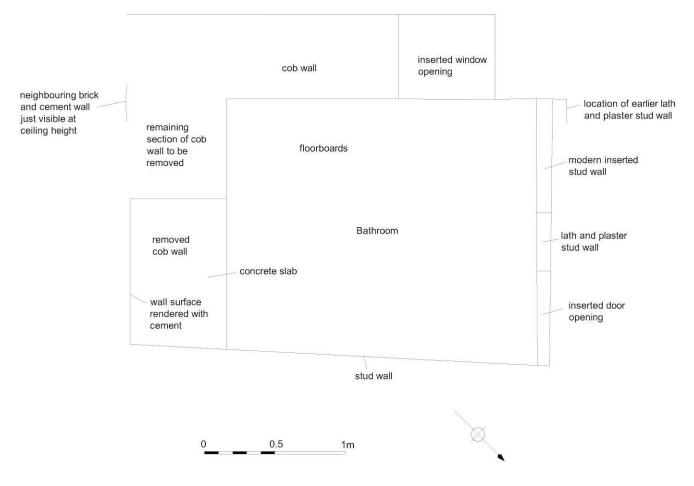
Plan of the bathroom showing 'remaining section of cob wall'
